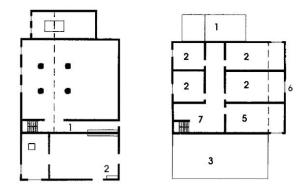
a, b: Reconstruction of 1st and 2nd floor (where was placed the school) of the wooden church.
